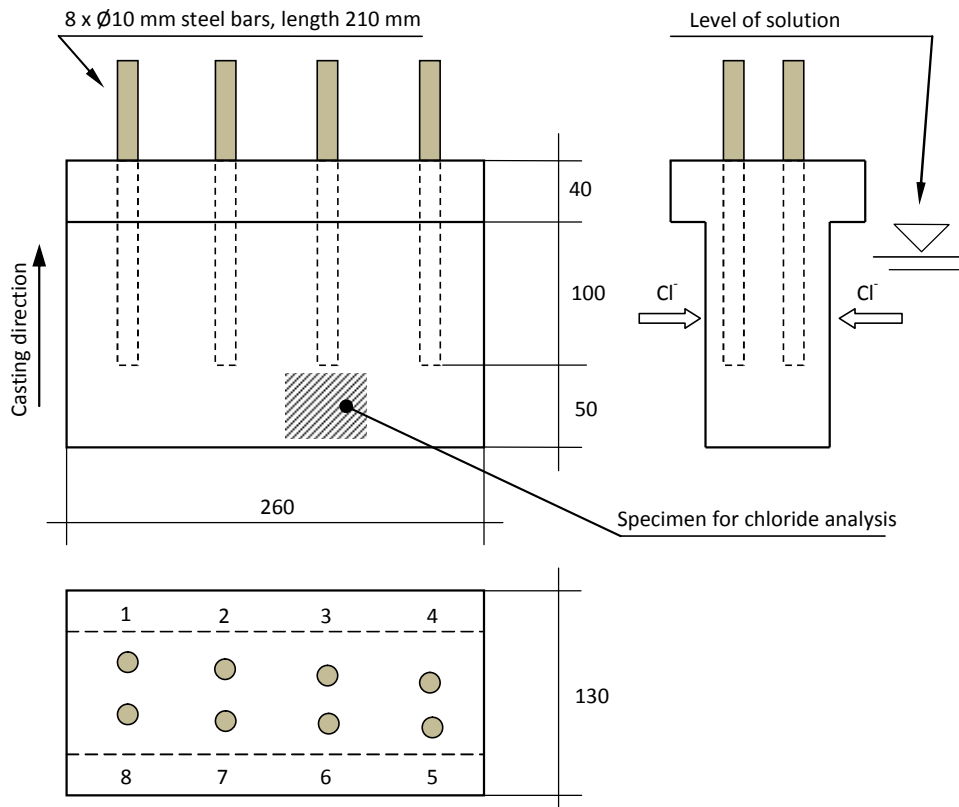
Concrete specimen embedded with steel bars, the dimensions are given in mm.
